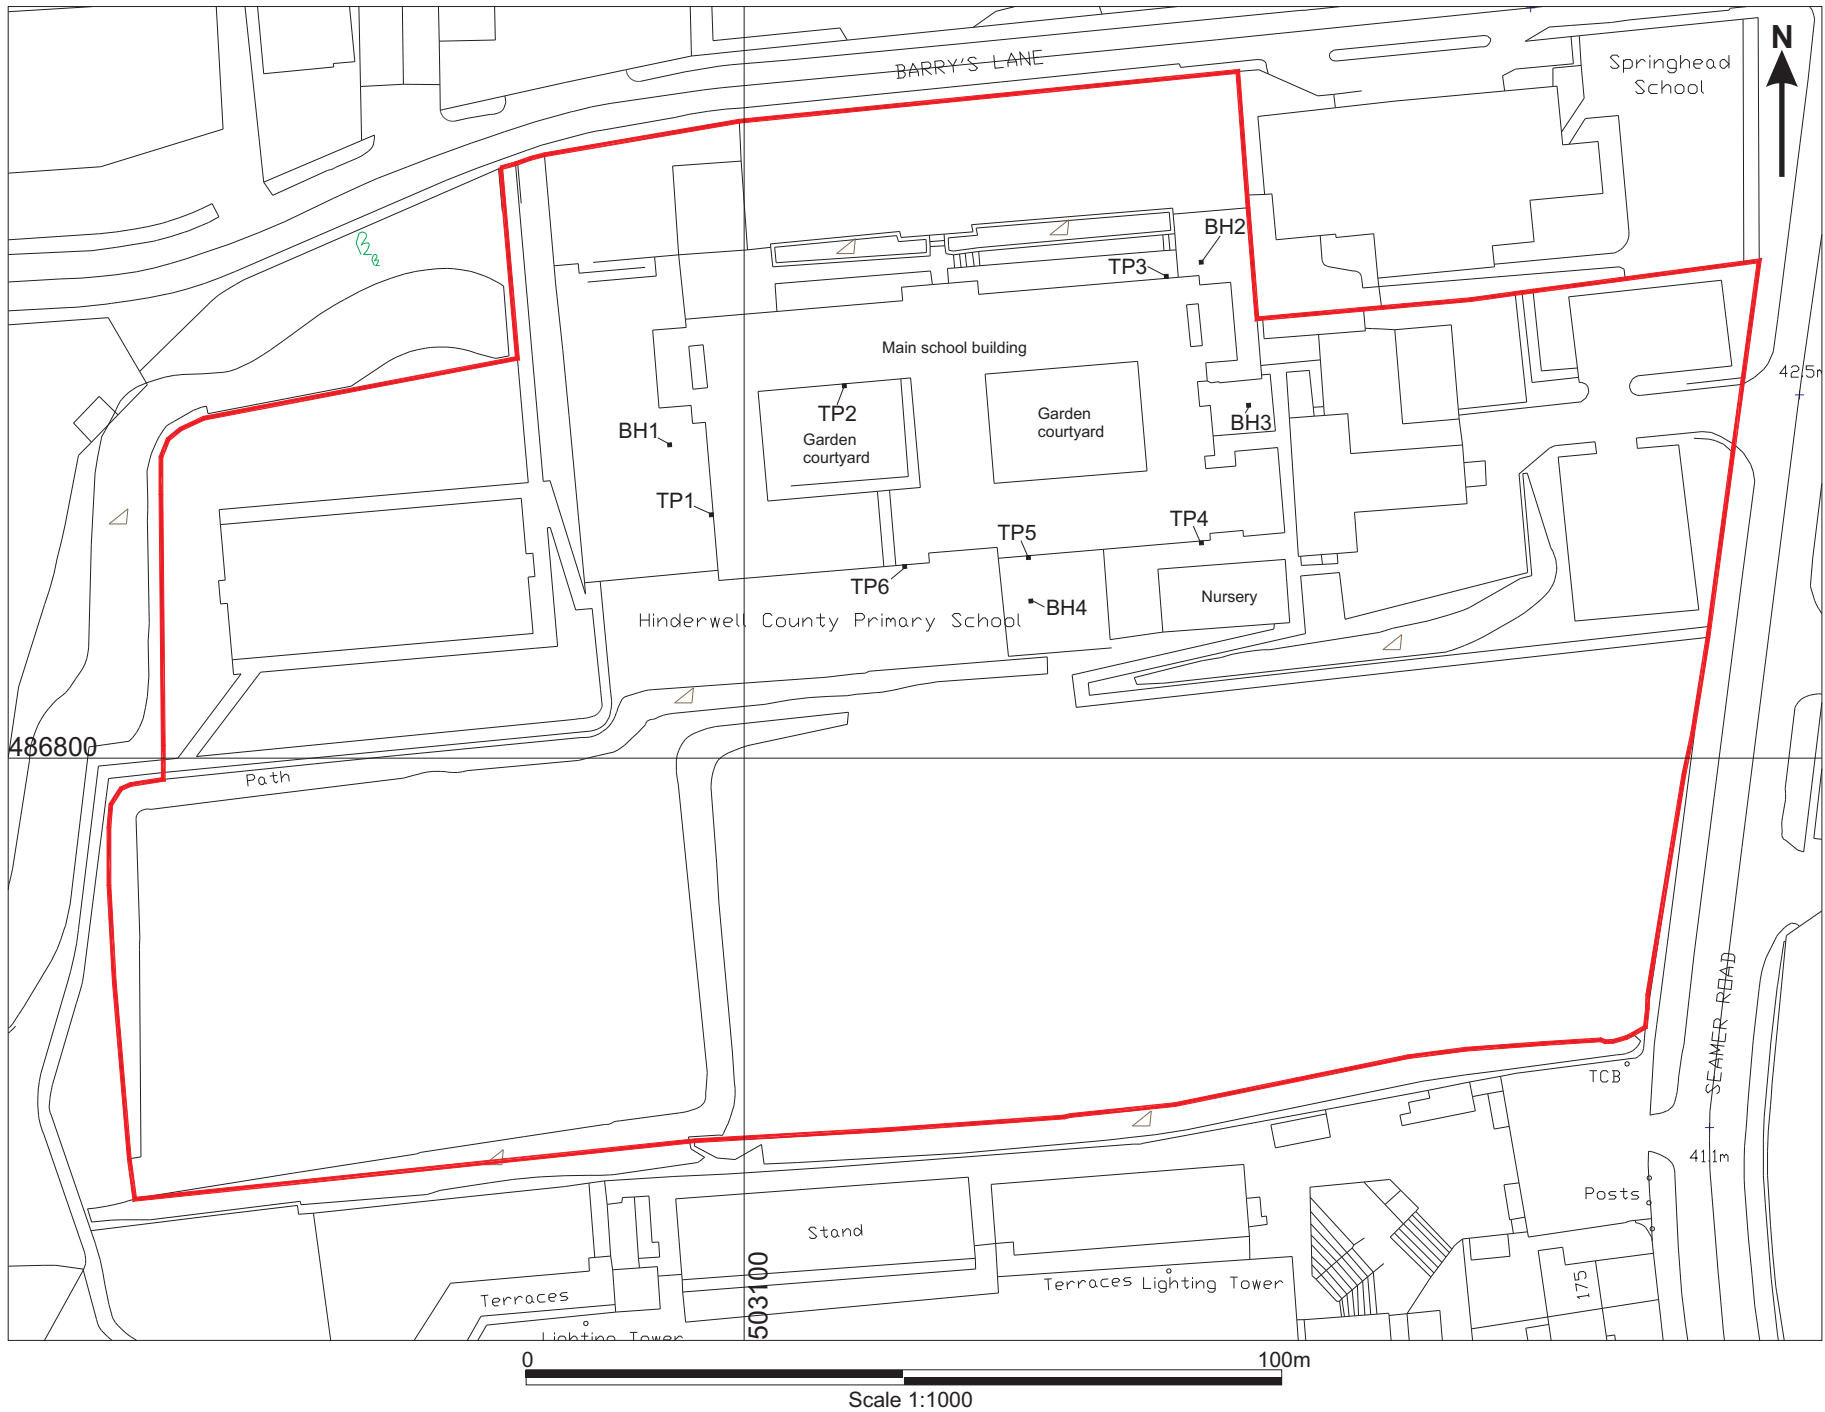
Site plan, showing location of Test Pits (TP) and Boreholes (BH) at scale 1:1000
